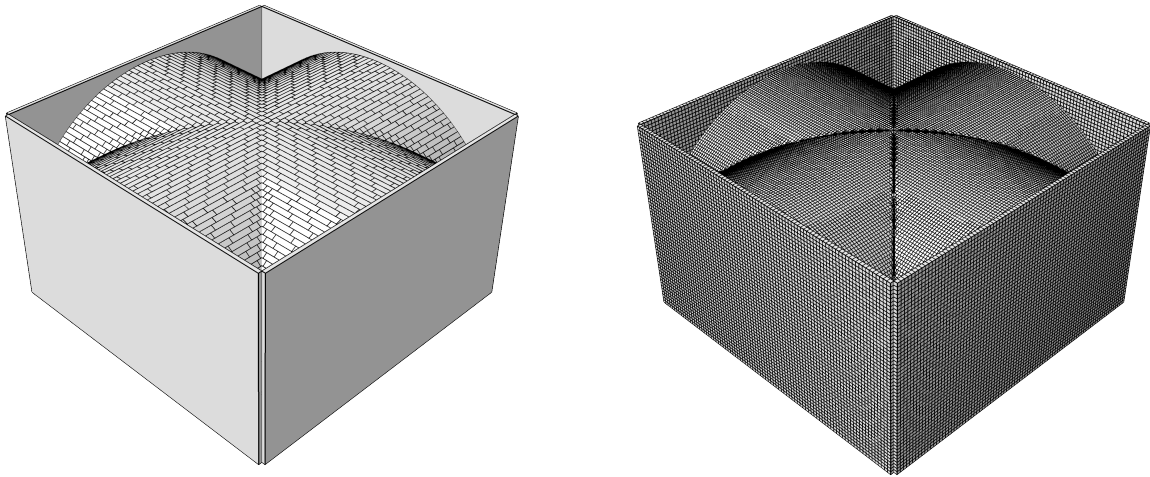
Geometrical model (left) and structural mesh (right) of a cross vaults with radial pattern and head walls
